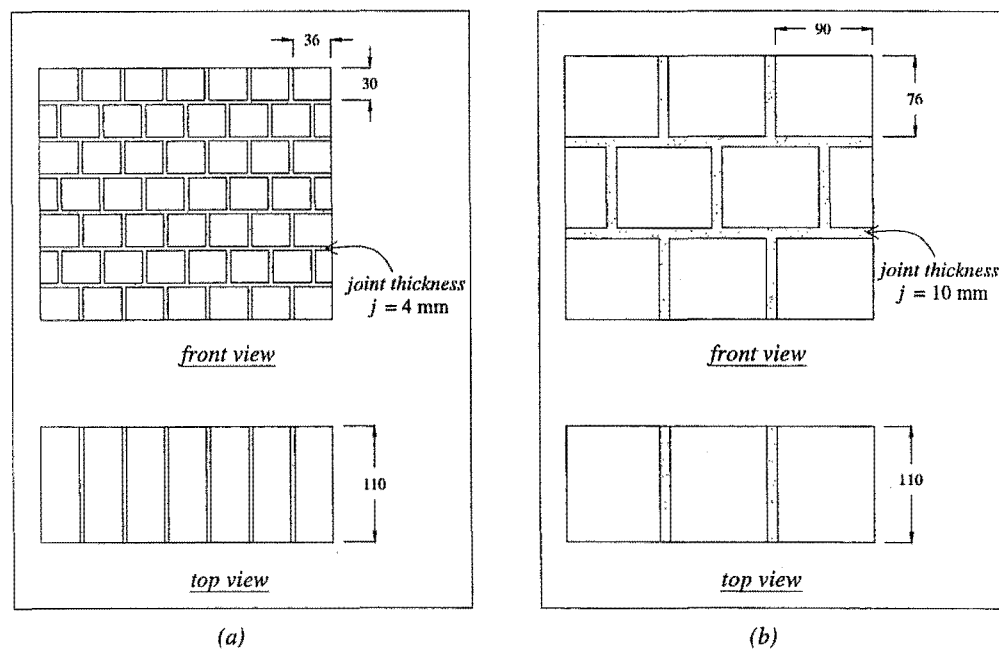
Masonry built with reduced bricks (a) and masonry as it was built (b)
